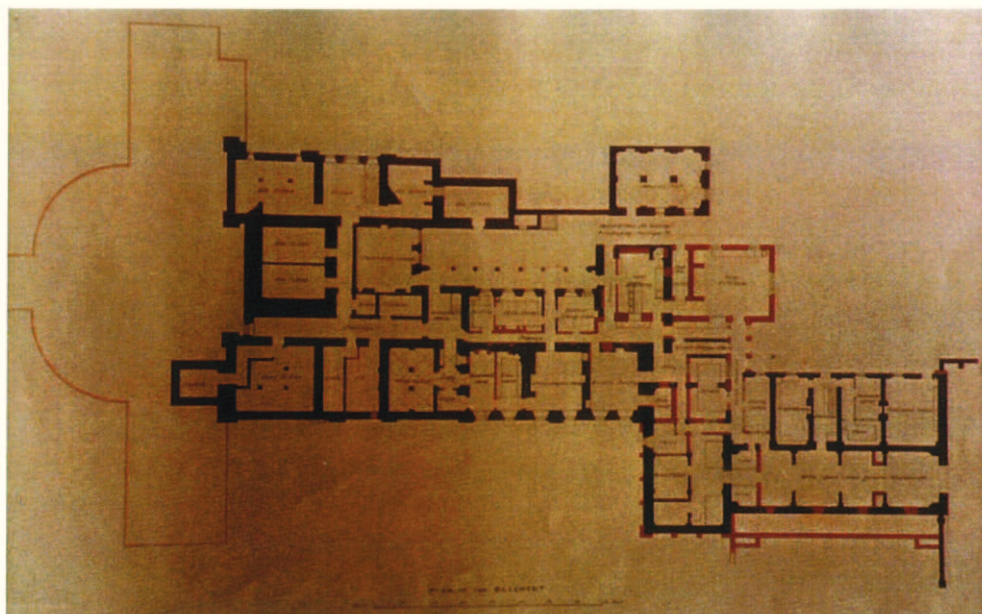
Sir Charles Barry's plan of the existing ground floor (in black) and proposed additions (in red); c.1834-35.
